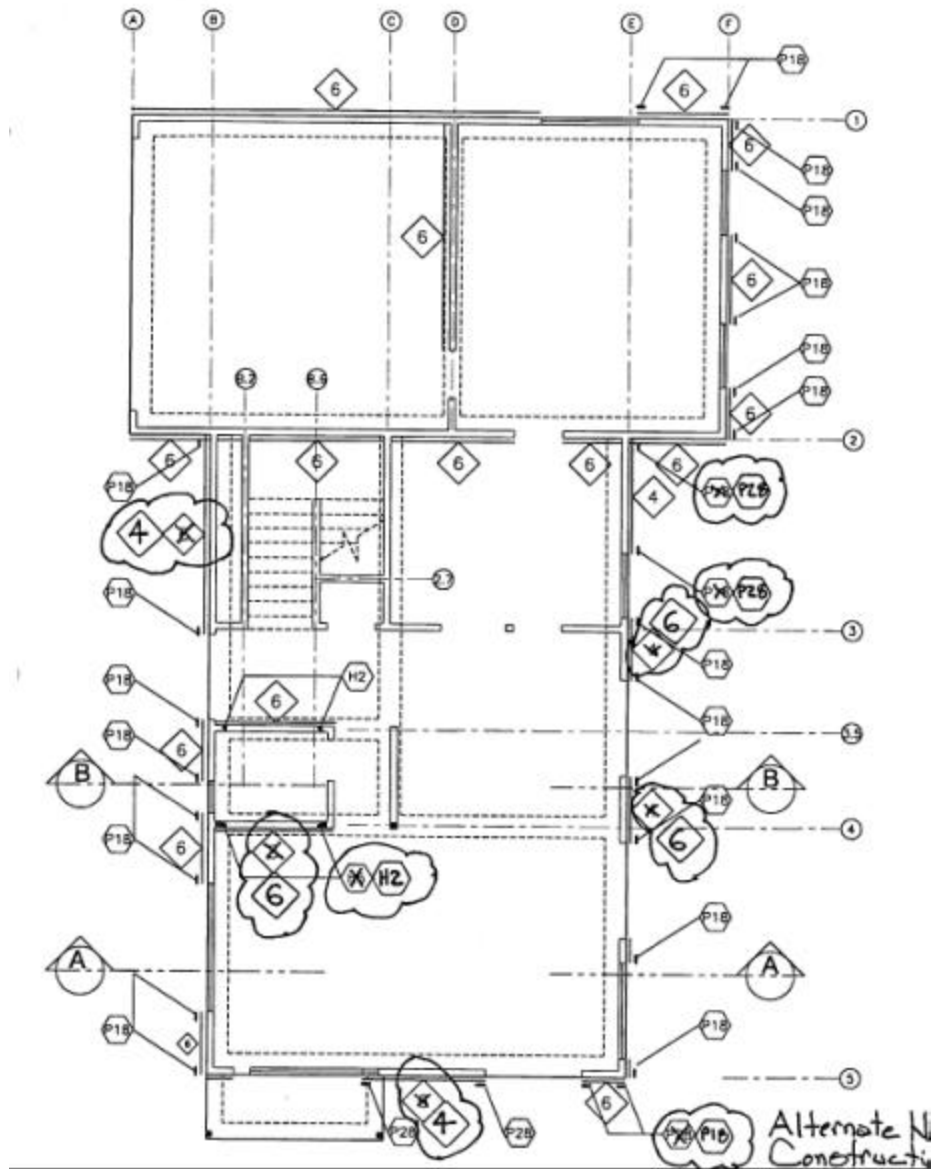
Modifications to First Floor OSB Shear Walls for Retrofit Measure No.4 of the Large-House Index Building.
